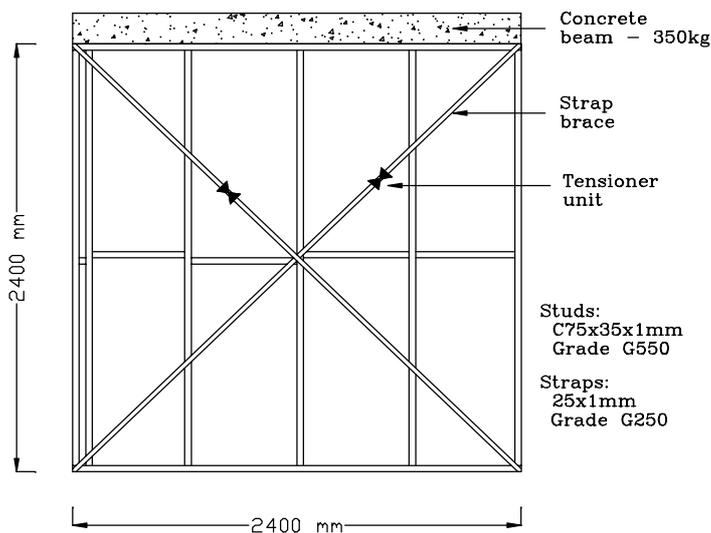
Typical tested isolated unlined wall frame with simulated roof mass.
